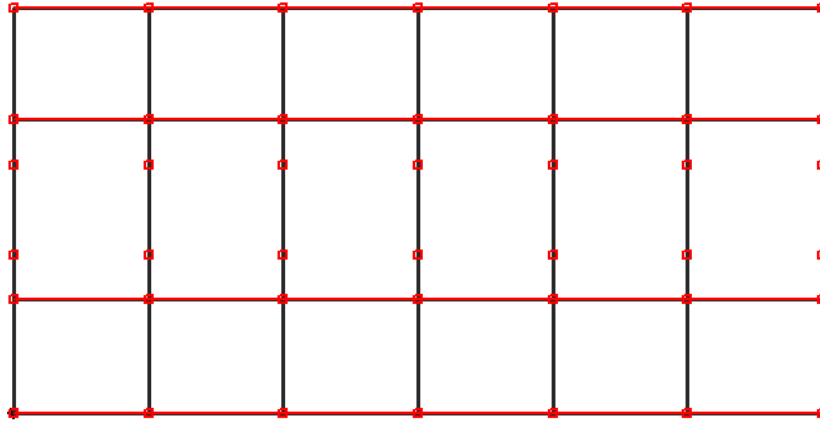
Typical floor plan with longitudinal beams highlighted in red
